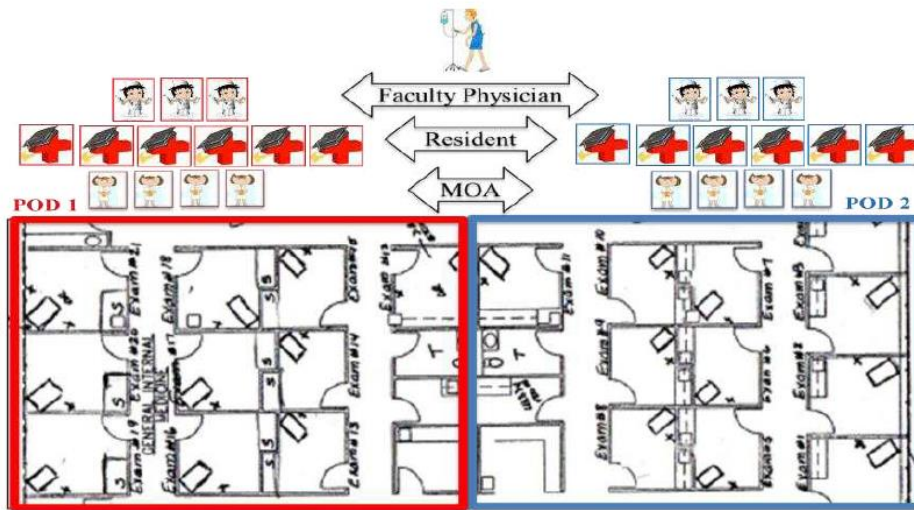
Floor Plan Layout (Norouzzadeh et al., 2015, p. 1360)
